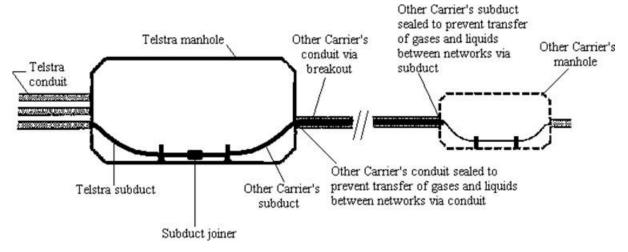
Sealing Conduits and Subducts to Prevent Passage of Gas or Liquids Between Telstra
